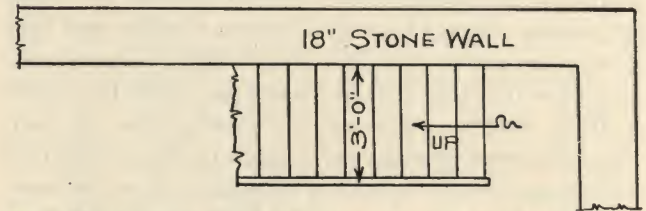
A misleading cellar stair plan if offered to supplement first floor plan (Fig. 144).
